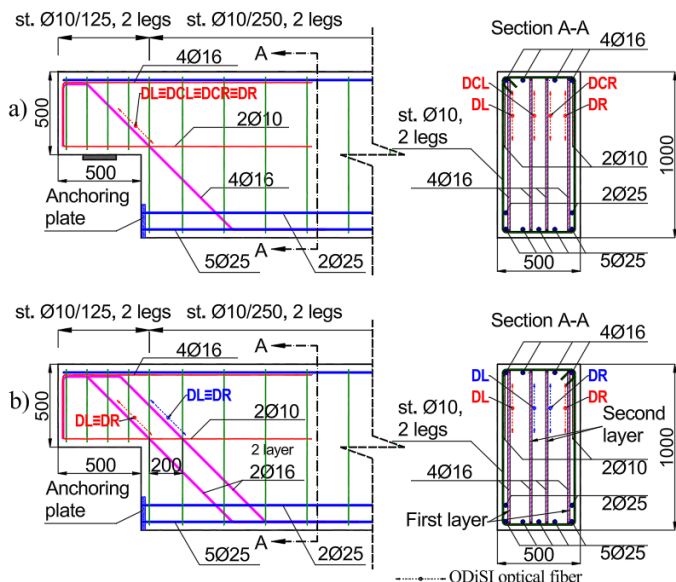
Reinforcement layout of specimens B2C (a) and B2D (b) / Disposizione delle armature dei provini B2C (a) e B2D (b).
